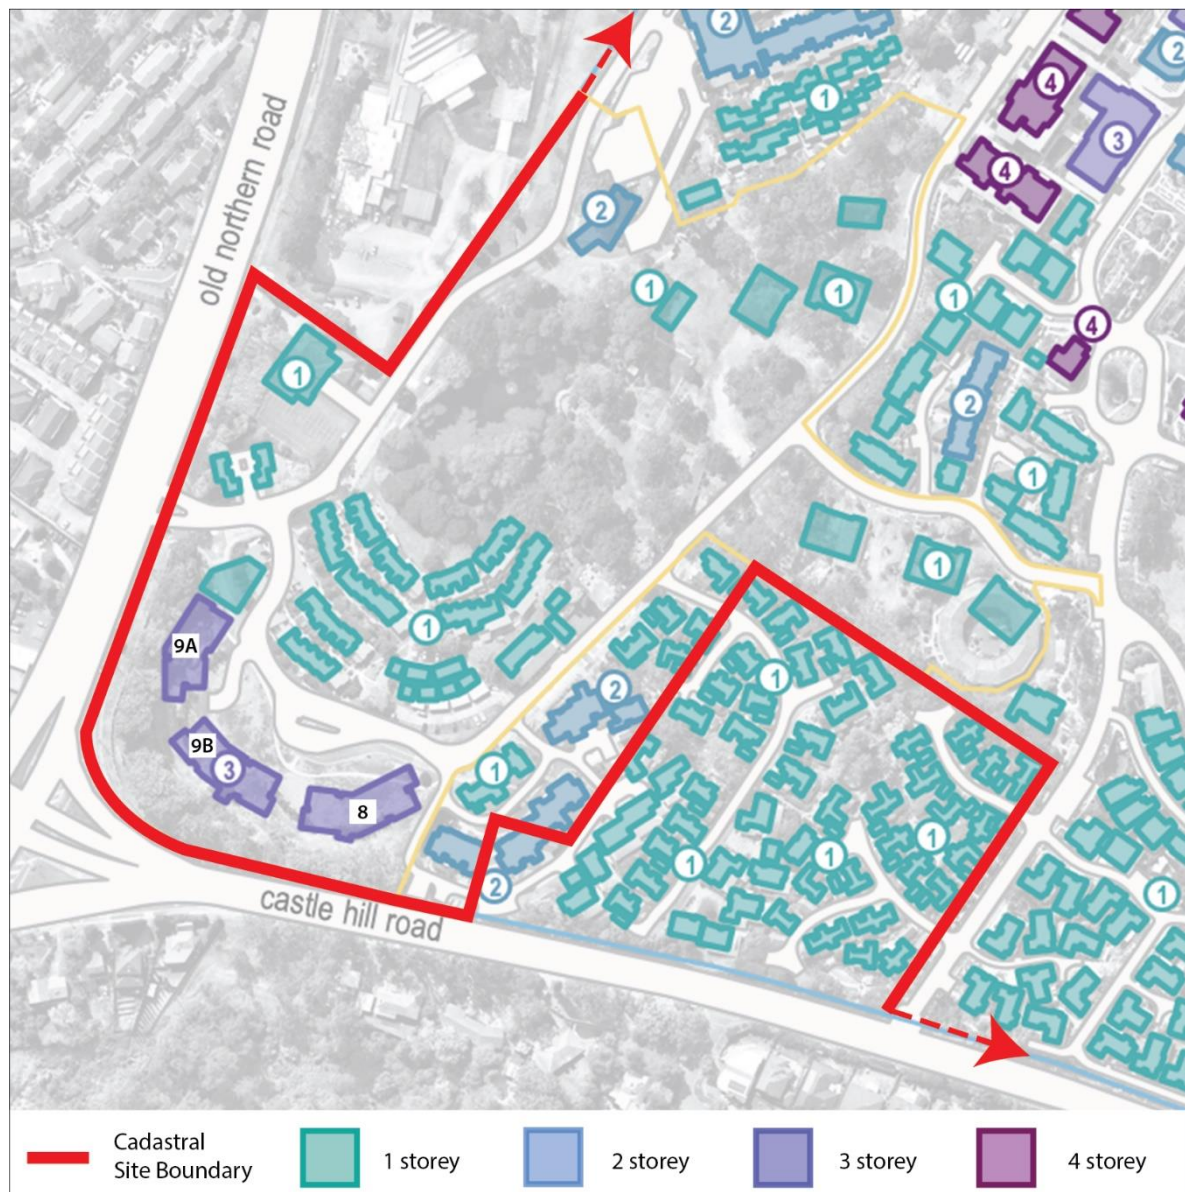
Proposed height of buildings and existing adjoining development (number of storeys)
